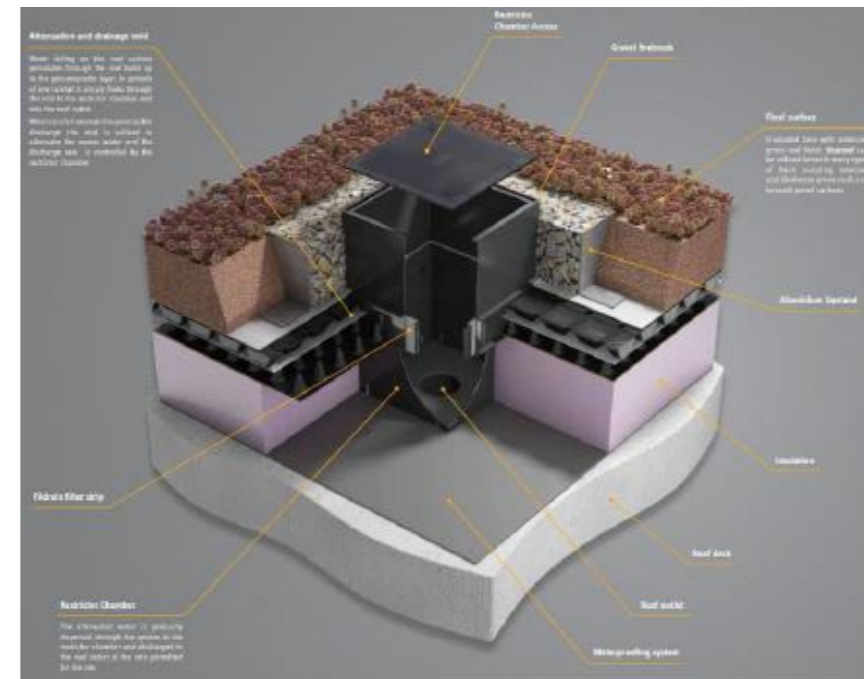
Typical blue roof construction (indicated with a living roof finish) (Source ABG Roofing Ltd)
